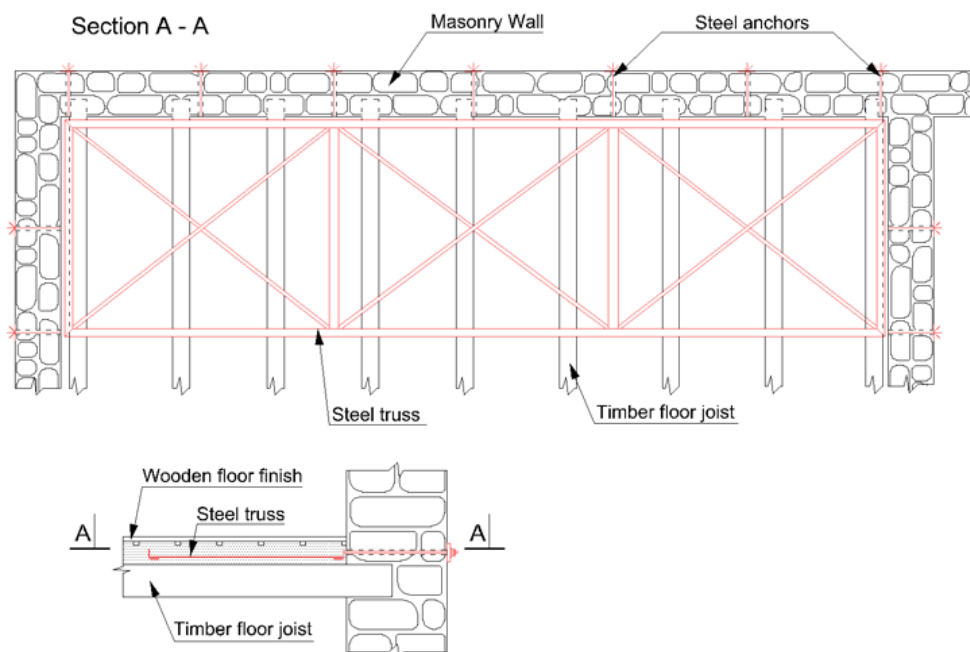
Stiffening of a large span timber floor by placement of steel truss [45]
